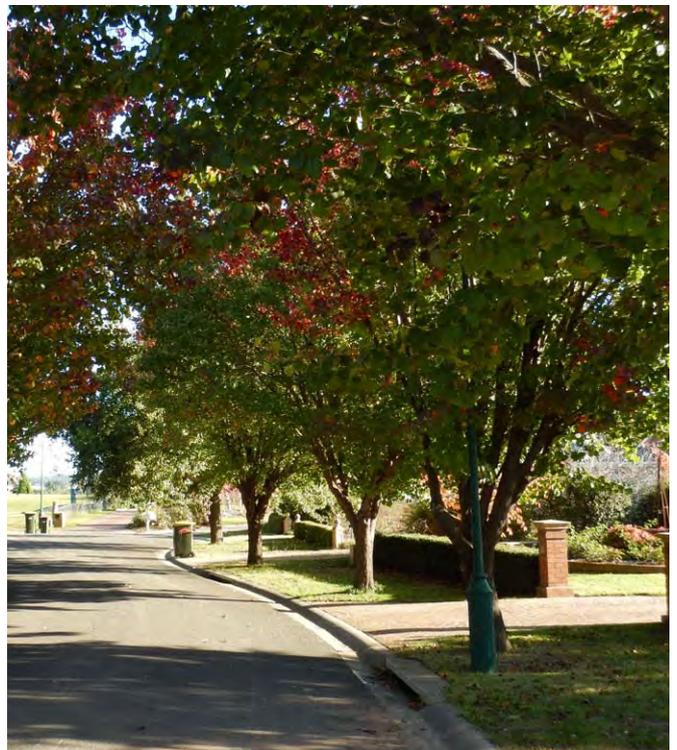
Sightlines for motorists entering and exiting private driveways needs to be considered when spacing street trees. The location of new driveways should take into consideration the location of existing street trees. (Photo - Arterra)
